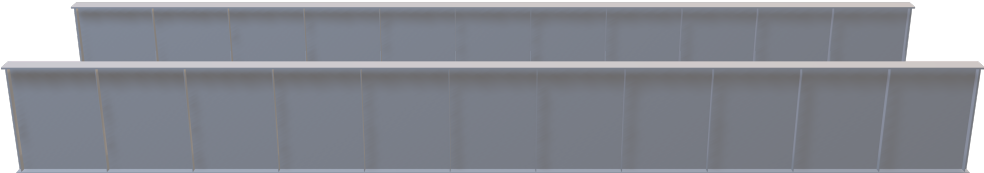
Bridge B4 – plate girder bridge with lower bridge deck.
